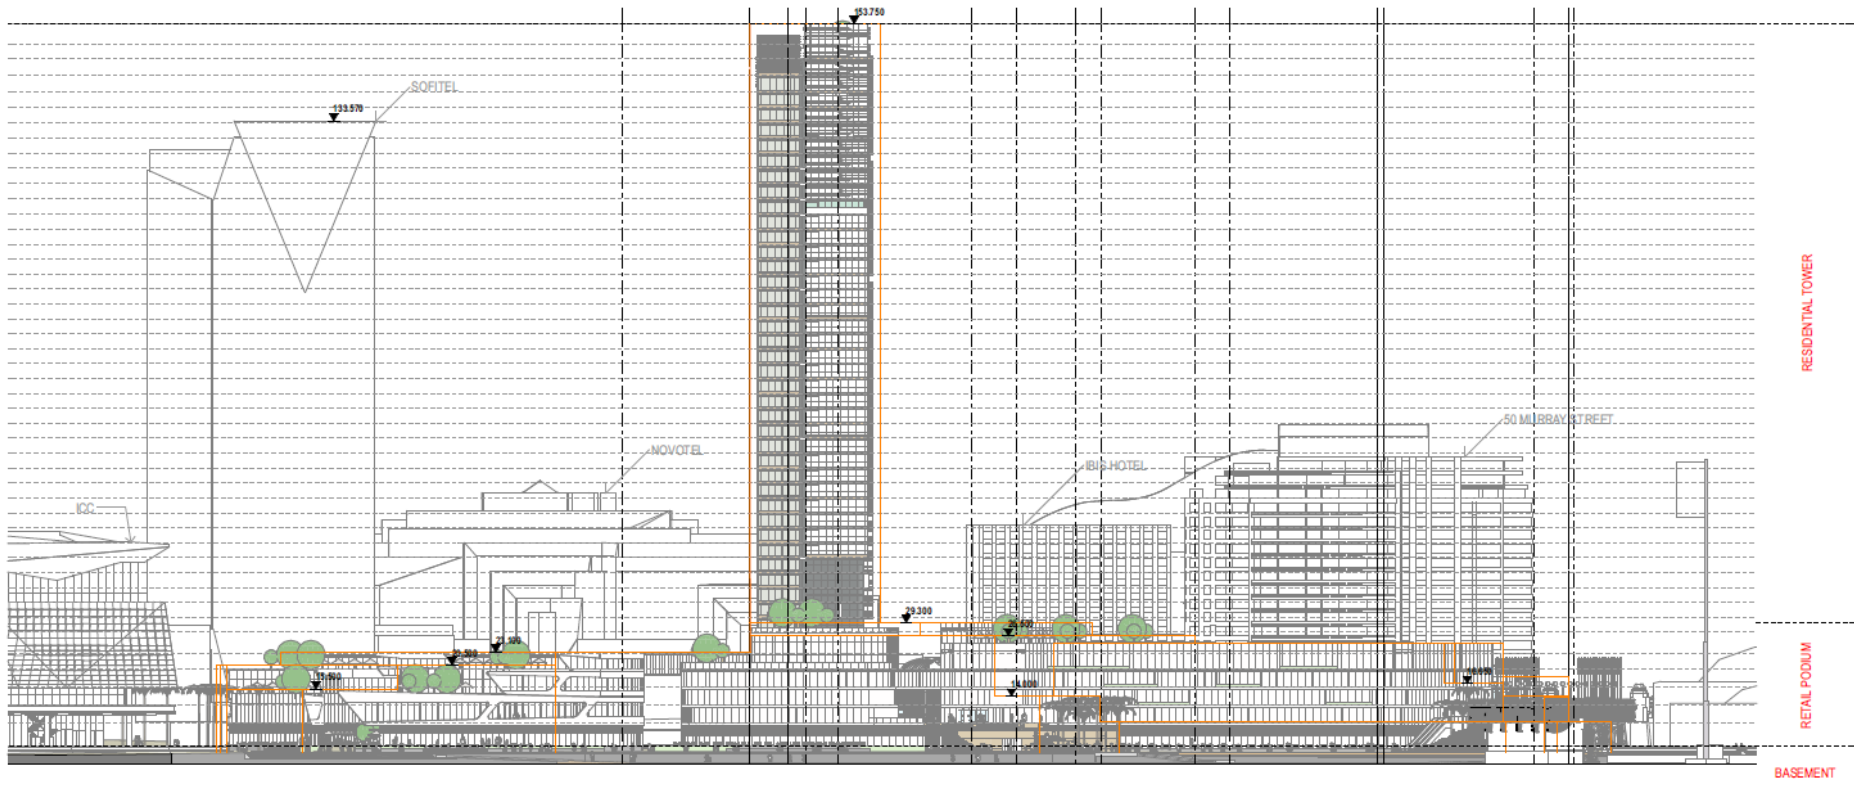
East Elevation – Indicative Elevation Only (Source: FJMT, 2020)
